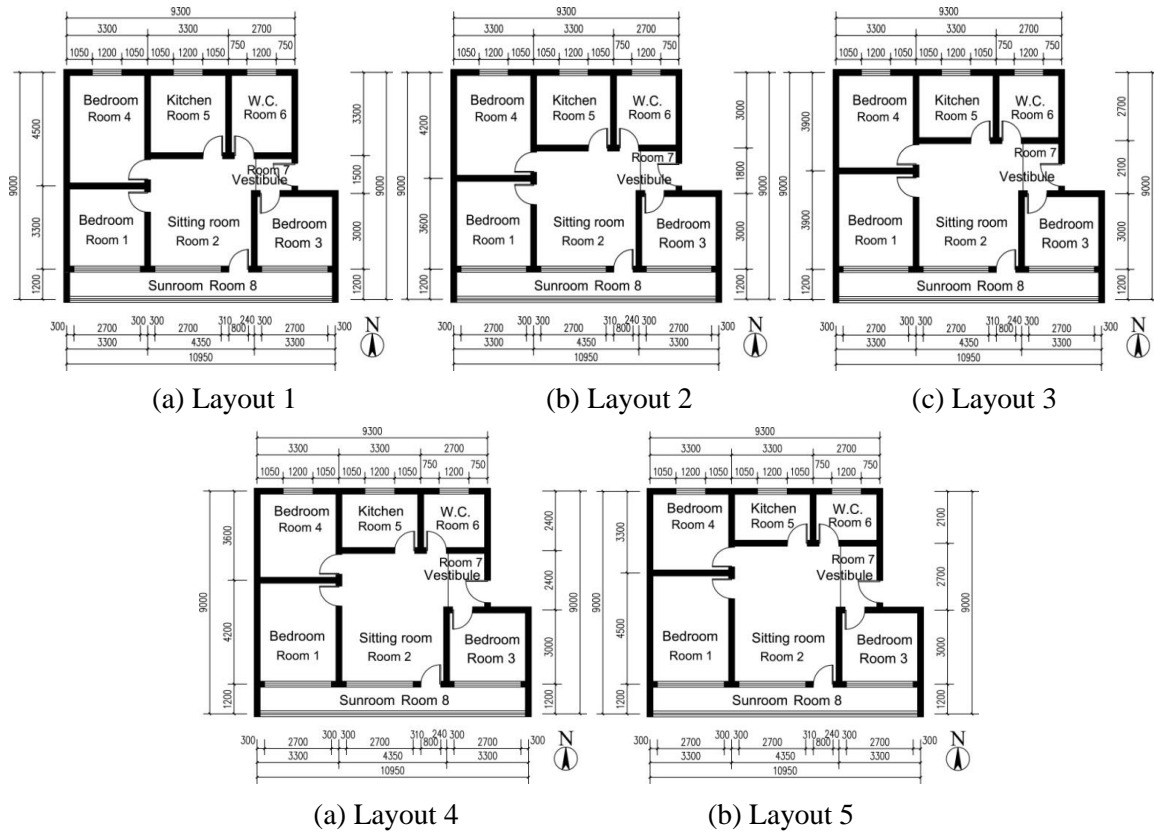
South and north room layout design models for sunroom unit (unit: mm)
